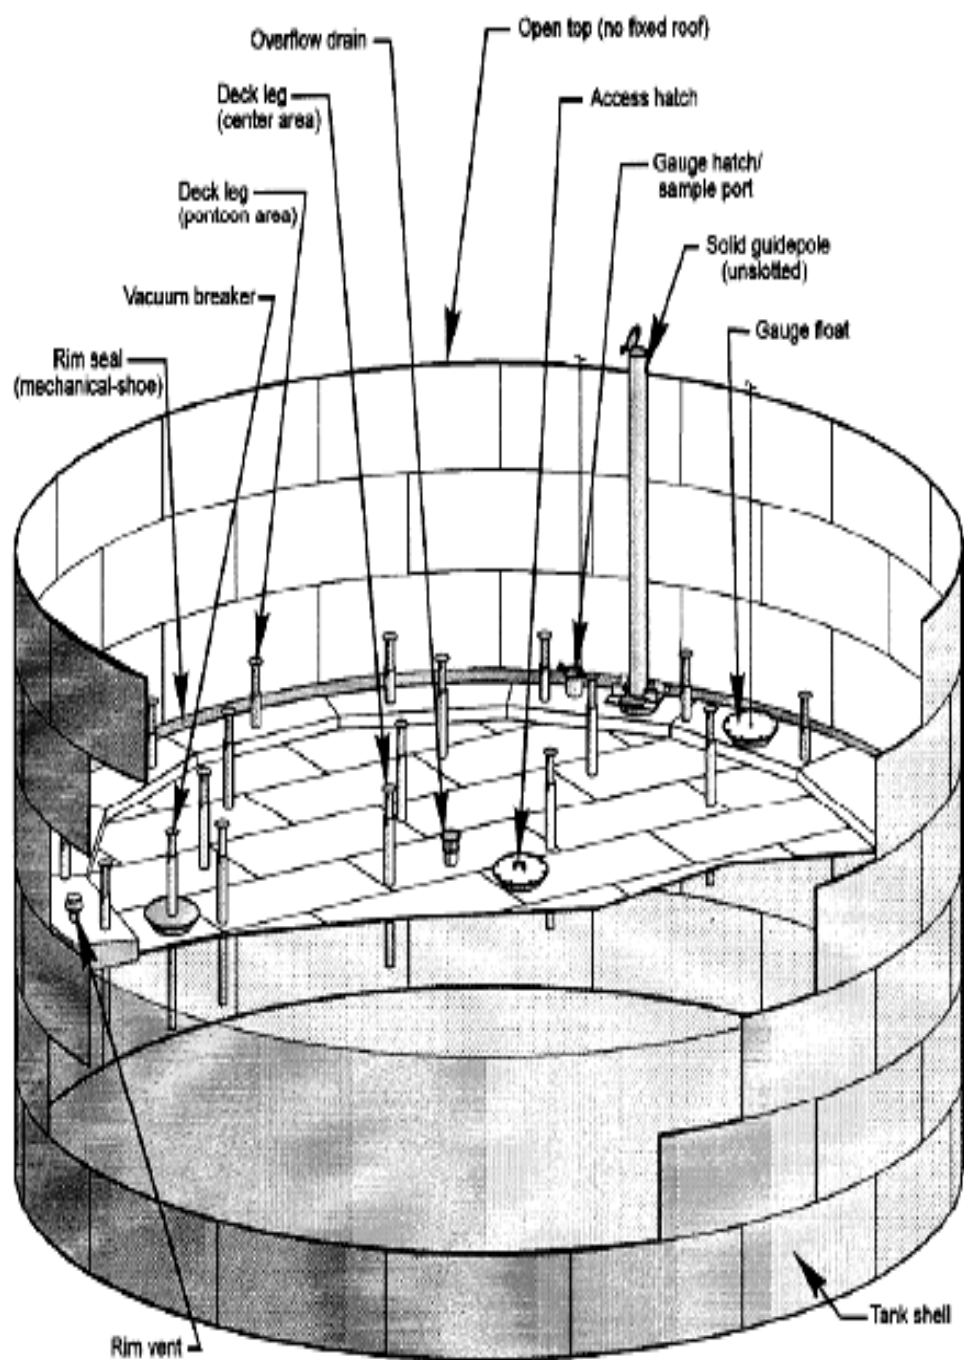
Floating Roof Tank (From AP-42, Section 7.1, U.S. EPA)
